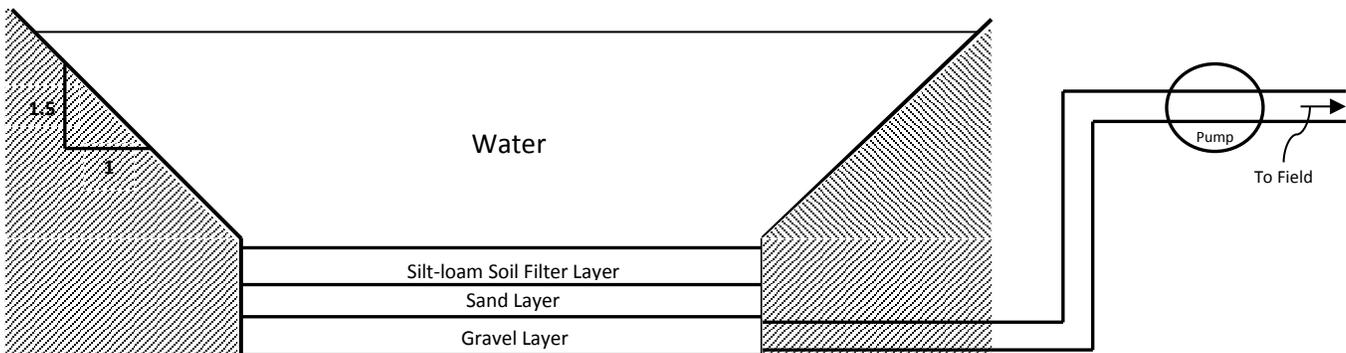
Filtration pond cross-section with gravel, sand, and soil media layers (not to scale).
